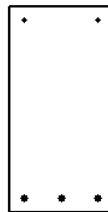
Reinforced Concrete - cross section [Matlab]
